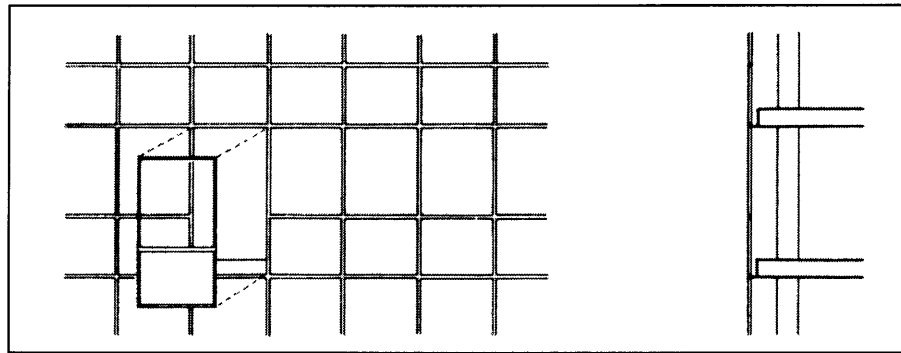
Sketch of typical structural frame system in building exterior walls.
